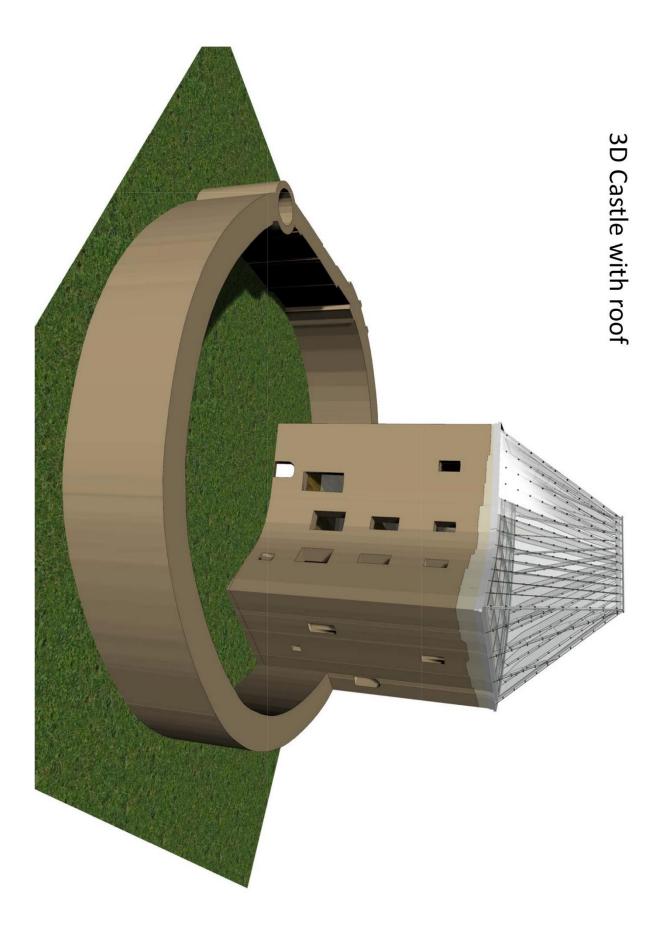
3D image of the model of the castle and new glass roof. Source: own ill.
